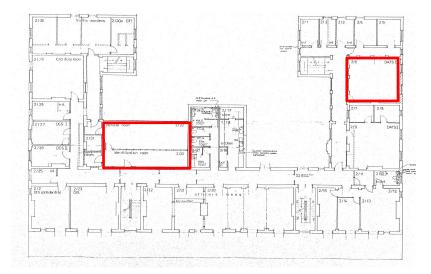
Roof terraces enclosed on 2/F plan in 1992 [ArchSD plan modified by author]
